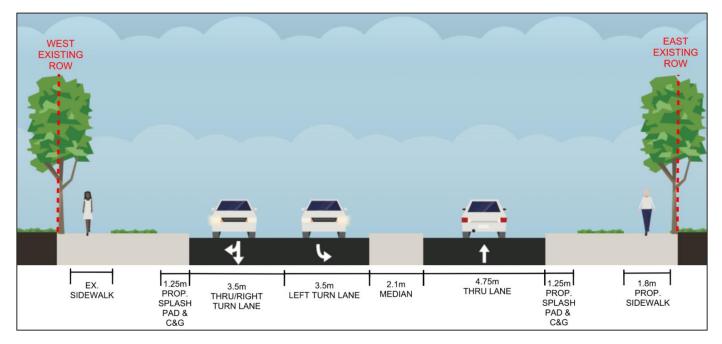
Menkes Drive/Telford Way Typical Cross-Section on Telford Way
